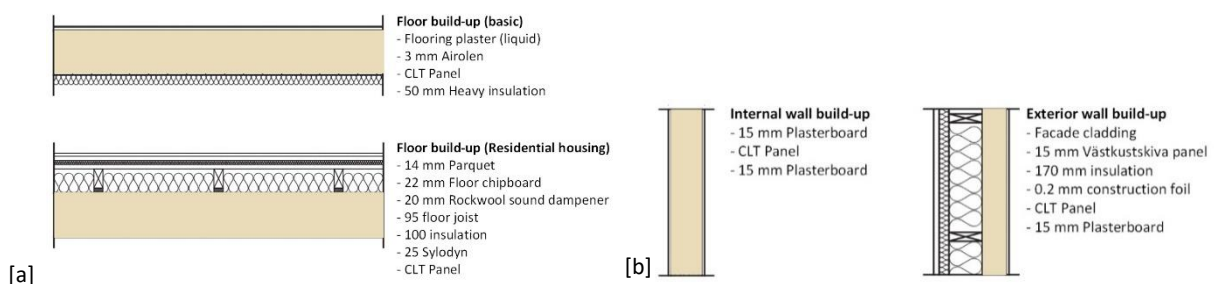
[a] Typical CLT-floor build-ups; [b] Typical CLT-wall build-ups (Martinson, 2016).
